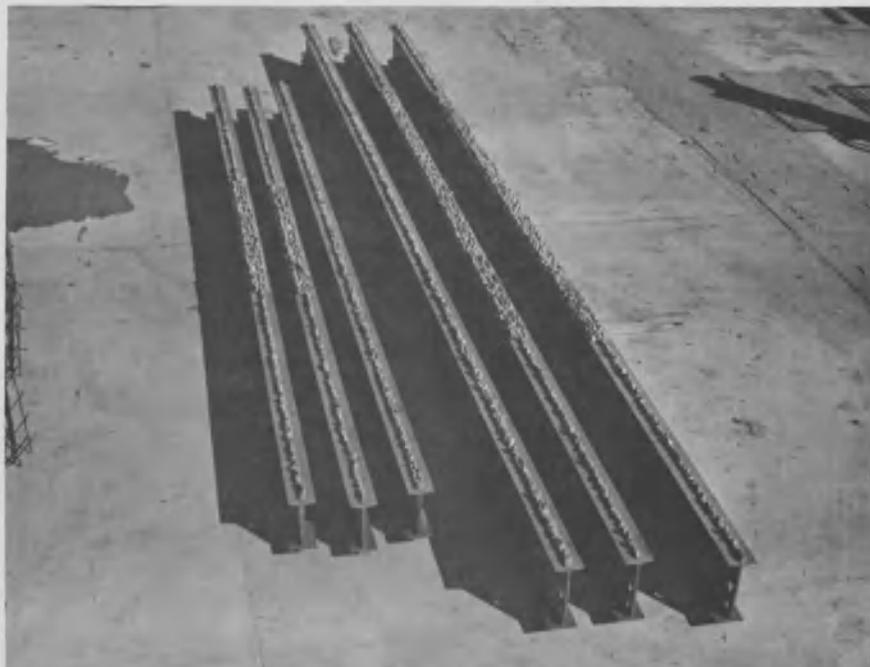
BEAMS WITH EPOXY SHEAR CONNECTORS
